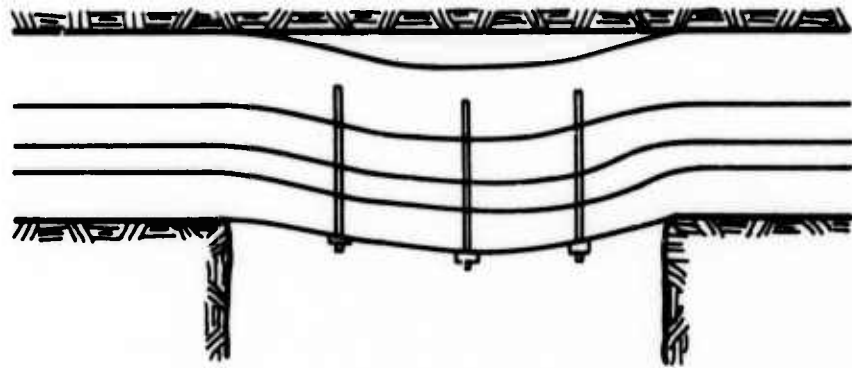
TYPICAL ROCK BOLTING FOR A STRATIFIED ROOF
